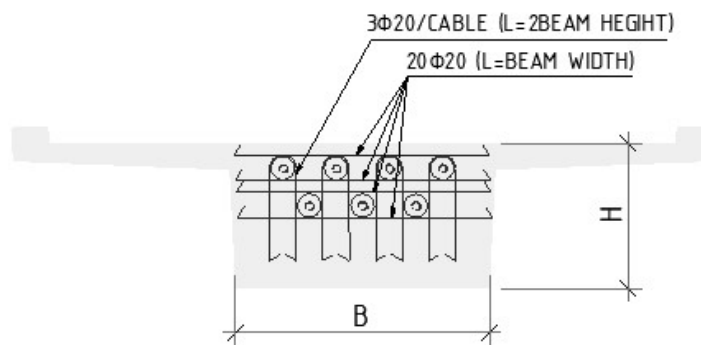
Section of shear and dowel reinforcement, beam.
